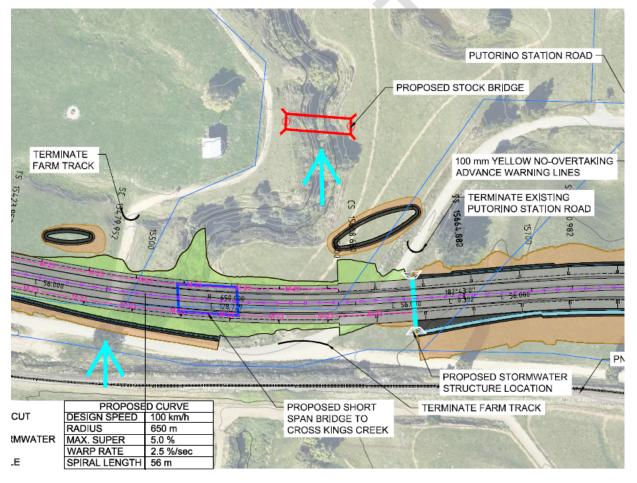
Site Plan – Proposed bridge locations – Extract from Preliminary Geometric Design Drawings – December 2021
